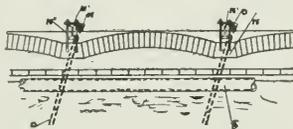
Fig. II.—Longitudinal Section Showing Arrangement of Arches
